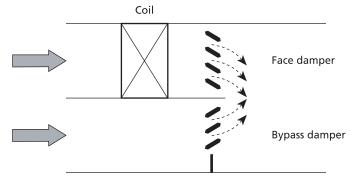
Face and bypass damper system, showing use of parallel blade dampers to assist mixing
